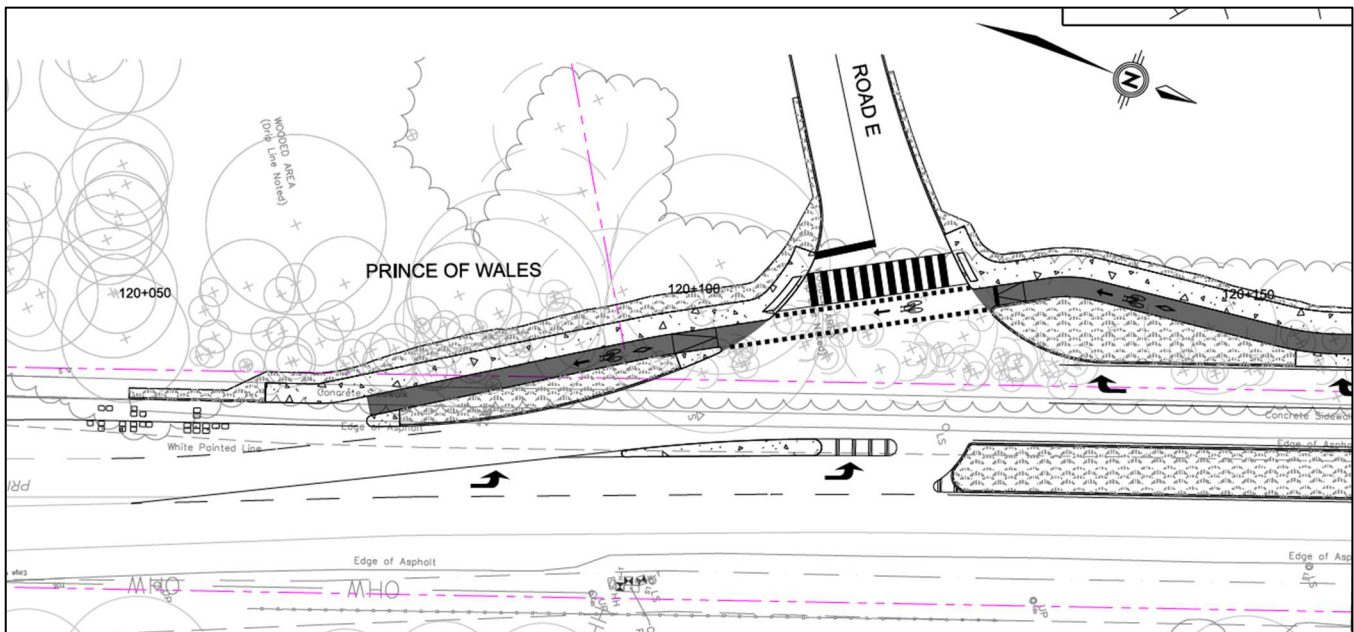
Prince of Wales Drive and Road E Intersection Improvements
